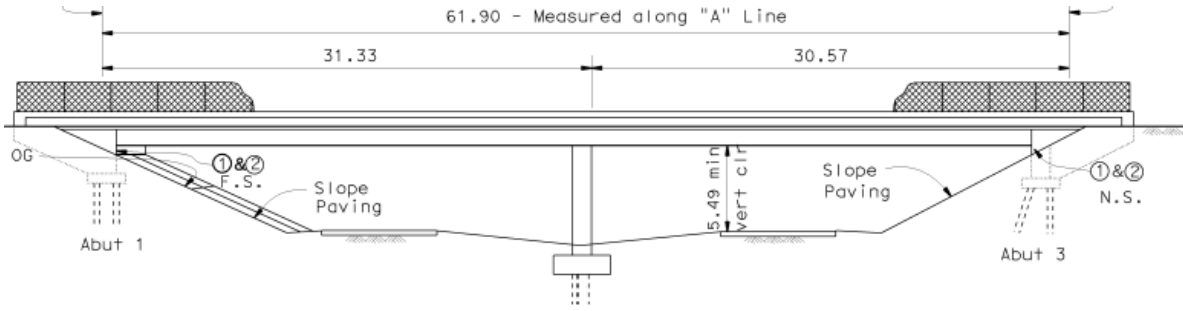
Schematic Elevation view of Adobe bridge (Caltrans)
